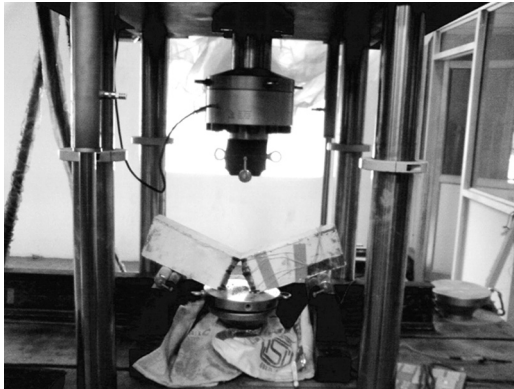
Tested specimen using servo controlled dynamic testing machine
